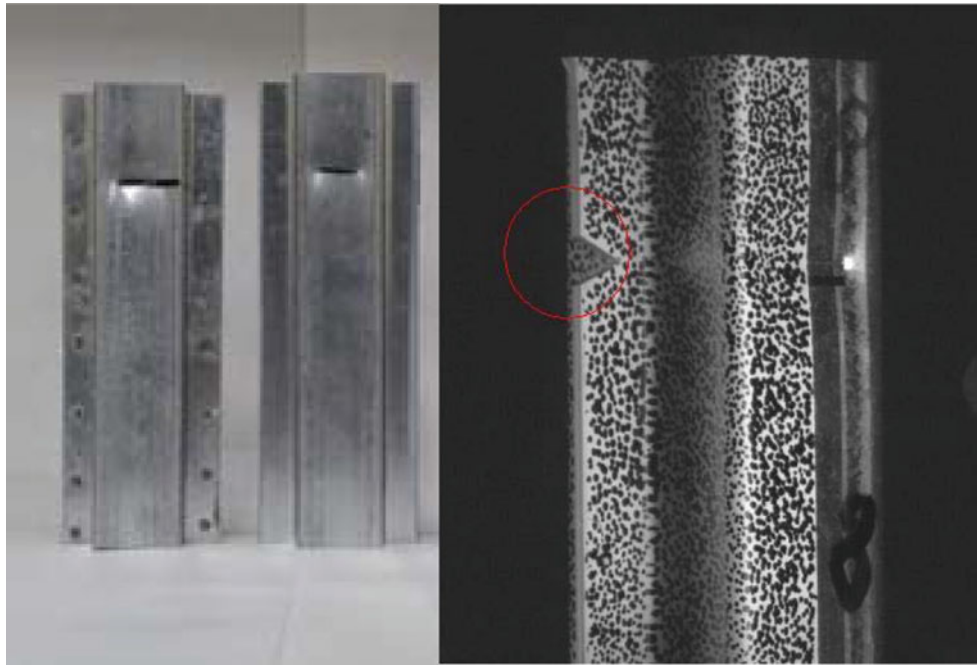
Steel sections, as received (*left*). Assembled tube dimensions (*right*)
